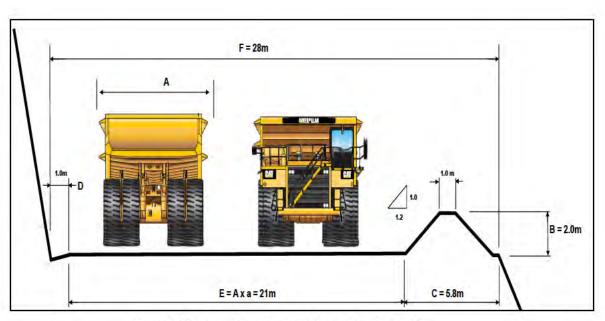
Pit Ramp Cross Section Schematic for Cat 785D
